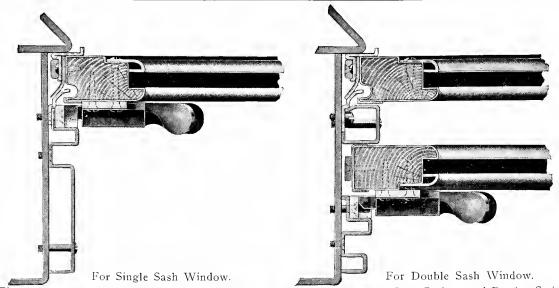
Insulated Copper Adjustable Sash, with Weather Strips, Metal Stop Casings and Parting Strips.
